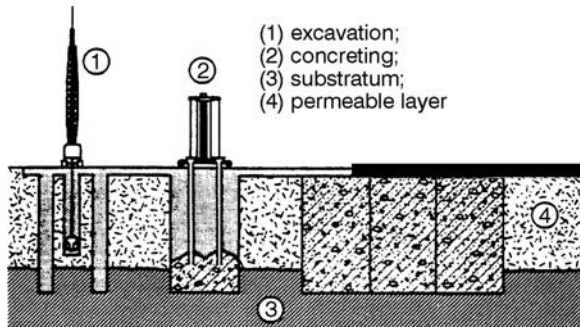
Concrete diaphragm wall (after Fell et al., 1992).
